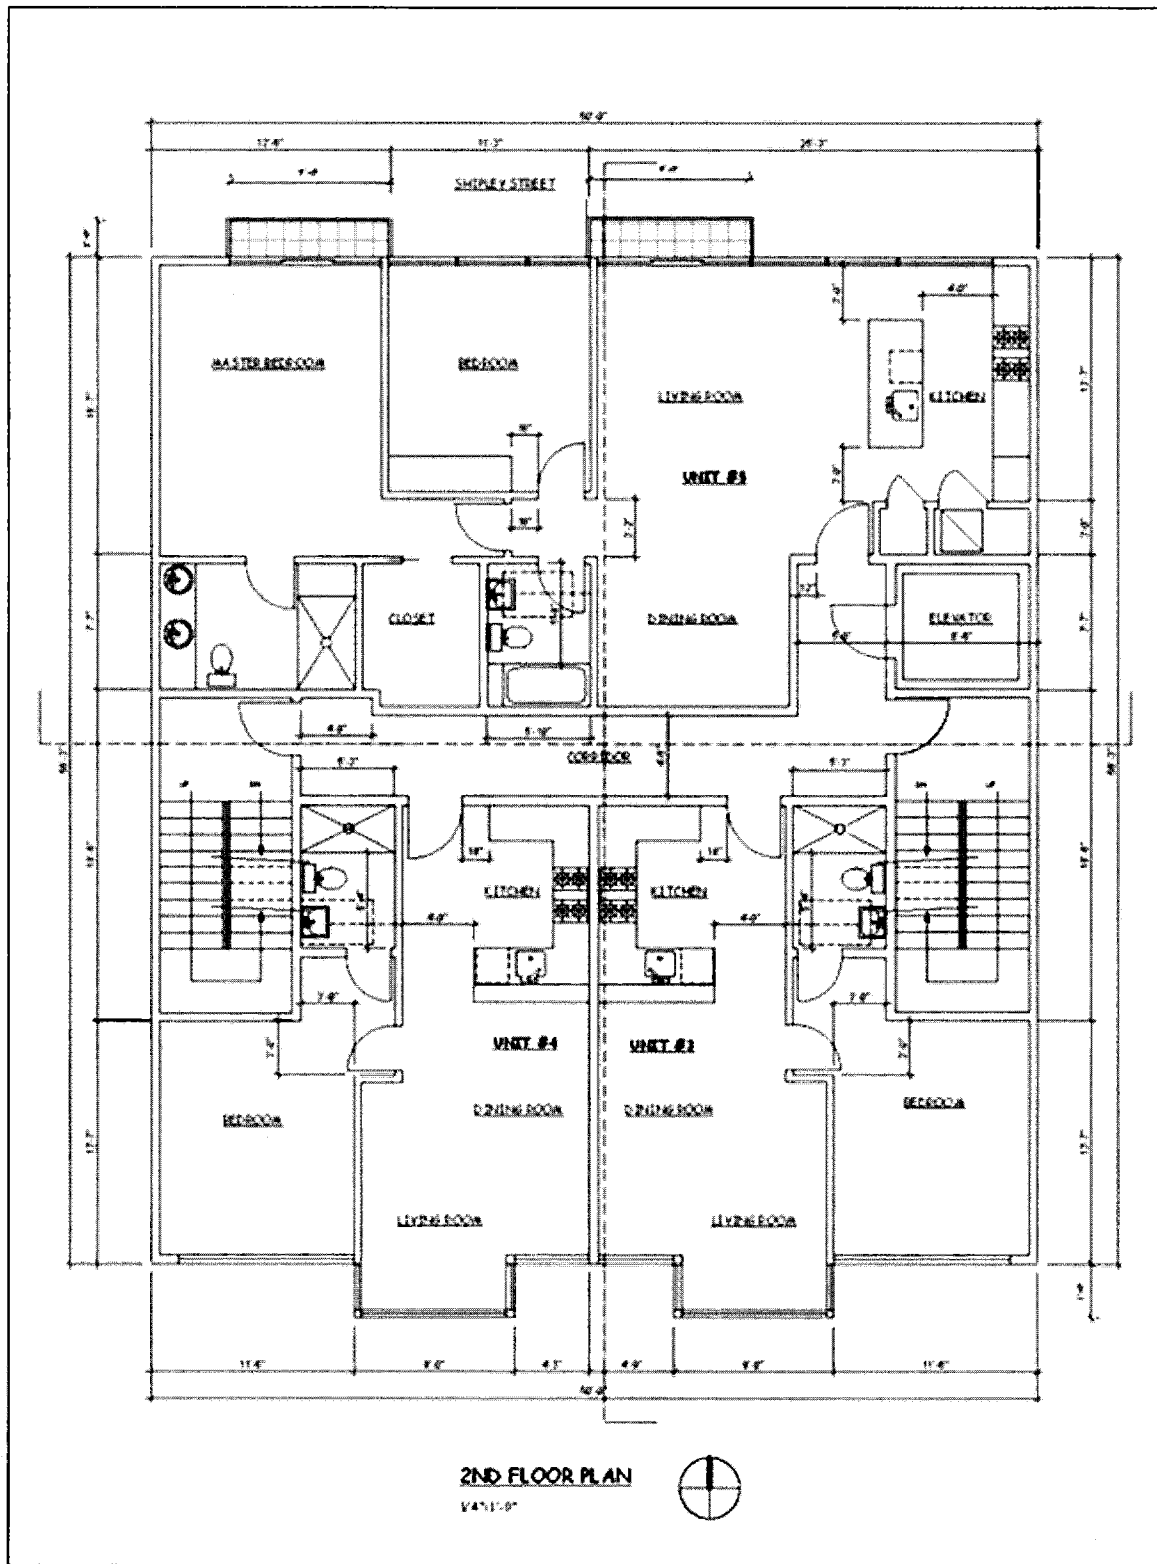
Proposed second floor plan (Source: William Pashelinsky Architect)
